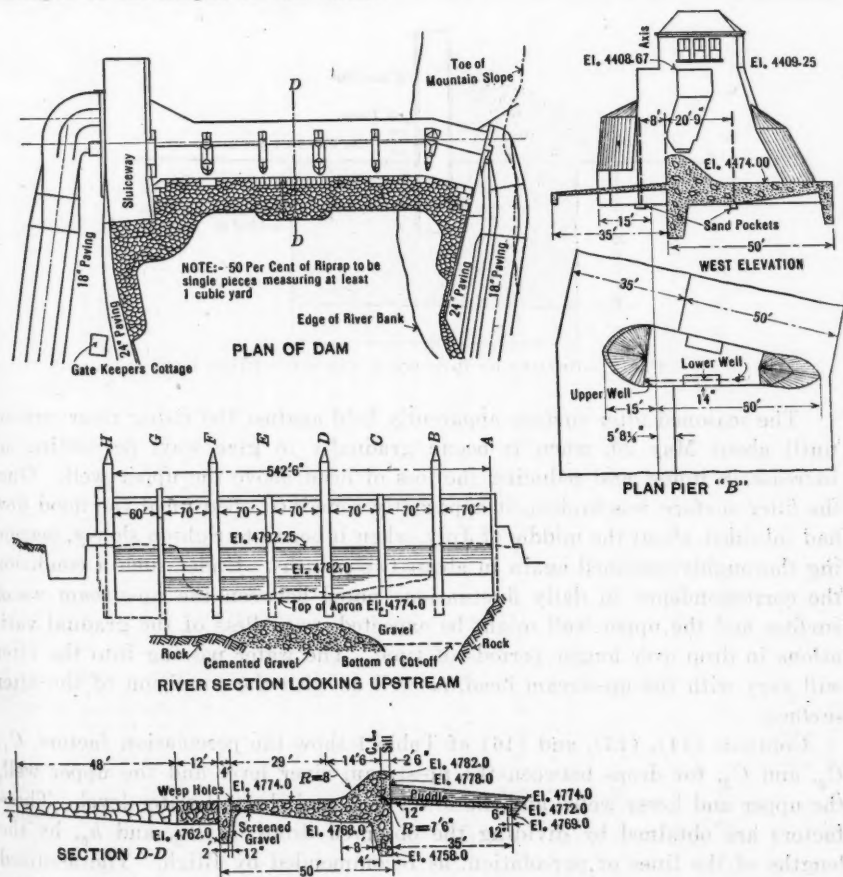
GENERAL PLAN OF COLORADO RIVER DAM.
